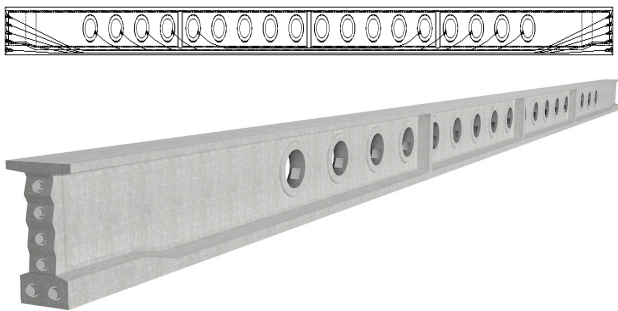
Schematic Diagram of Many Opening Long Span Prestressed Concrete Girder
